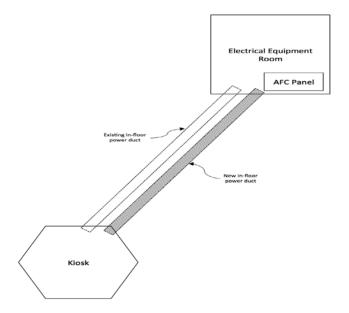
Typical New Duct Installation, Kiosk to Electrical Equipment Room (Example Schematic)
